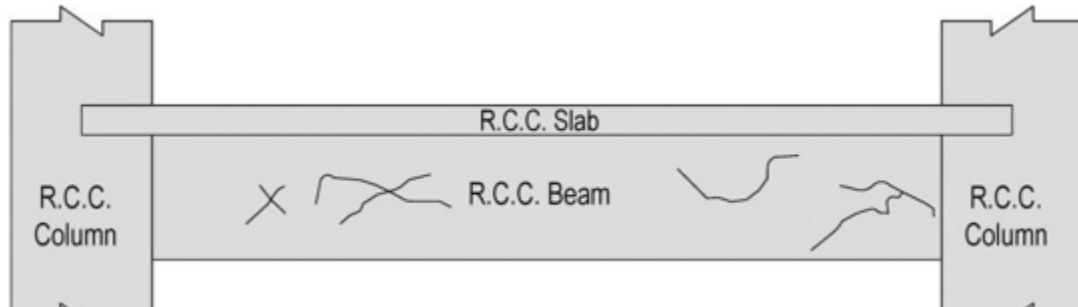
Shrinkage cracks in RC beams (Jaydutt Tailor, 2017).
